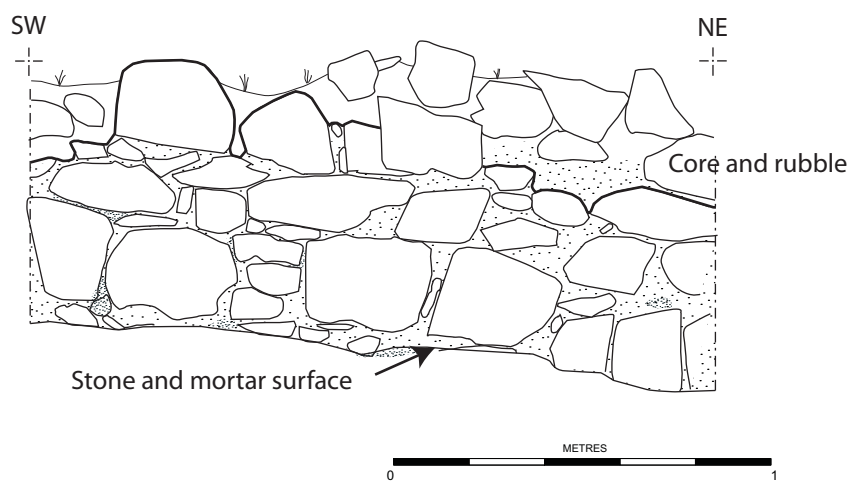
Trench 5, Elevation of inner face of curtain wall
